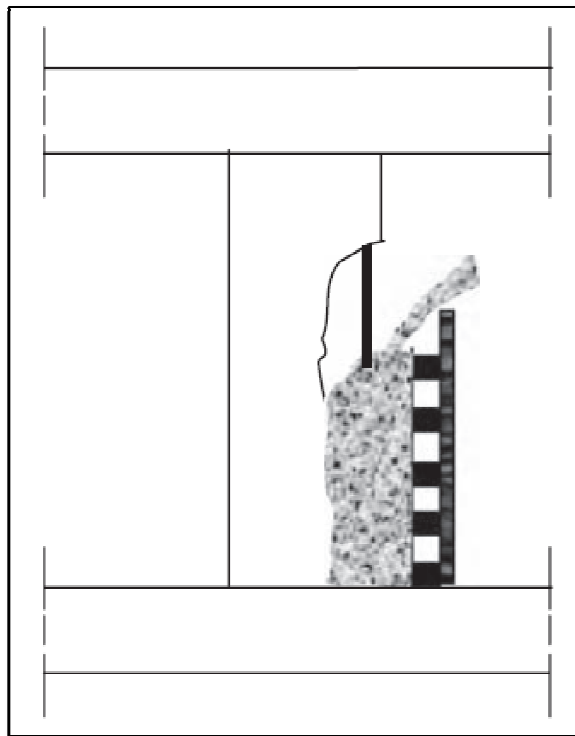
Casting Concrete On-Site (El-Reedy, 2008)
